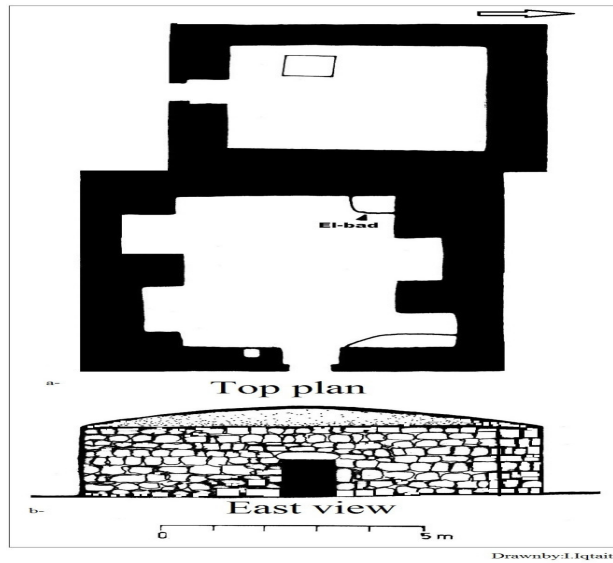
a. Ground-plan of the first traditional building; b. elevation of its eastern façade.
